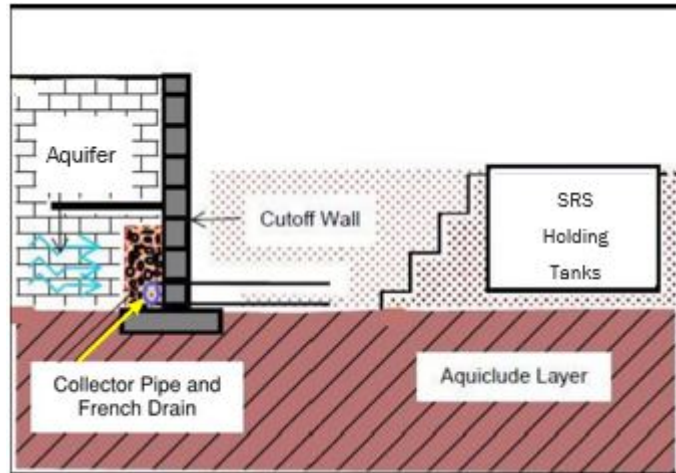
Improvement Phase 1: Cutoff wall and French drain
